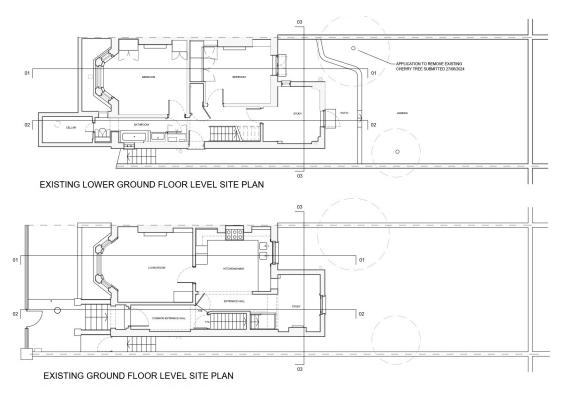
Existing Ground and Lower Ground Floor Level Plans (refer to dwg EX_002)
